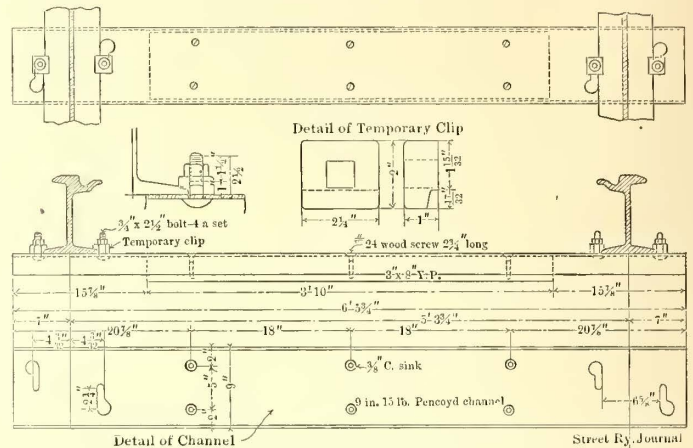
TEMPORARY TIE AND CLIPS FOR TRACK CONSTRUCTION
